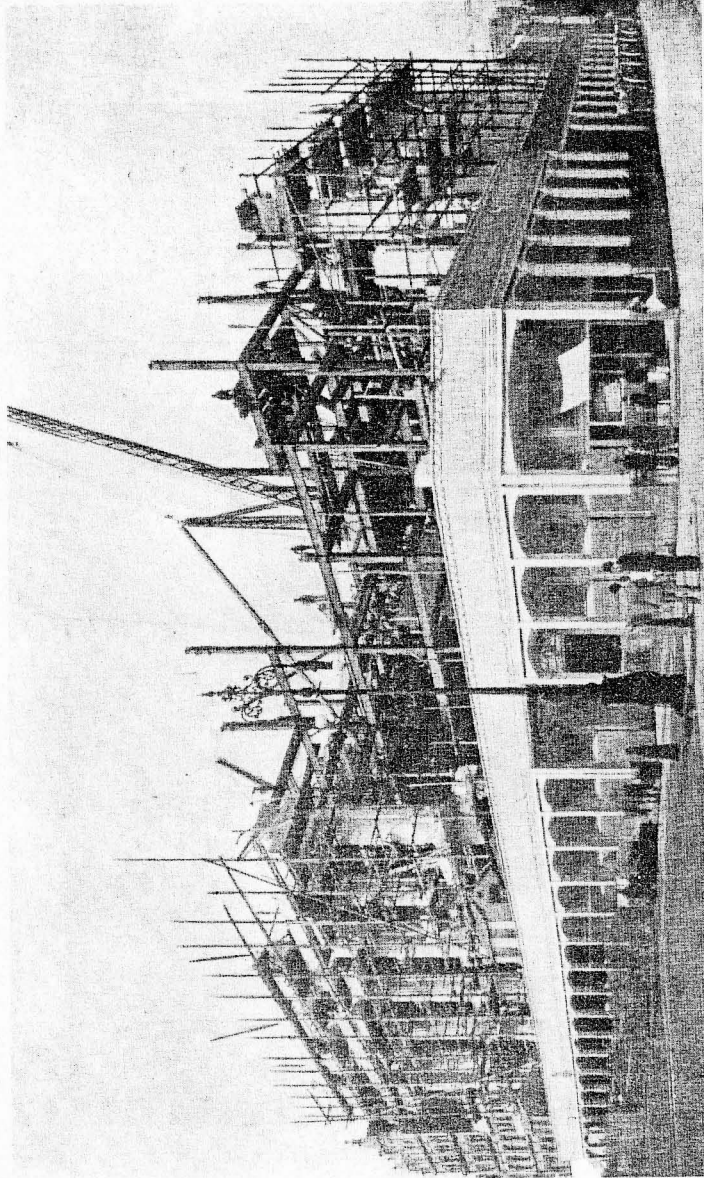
Selfridges: the steelwork erected to the third floor except on the last bay (from *Concrete and Constructional Engineering*, March 1909).
